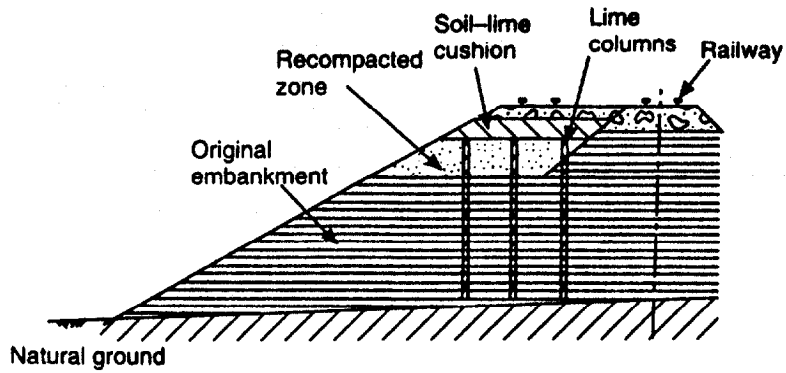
Cross section of a stabilized railway embankment in Bulgaria (Evstatiev et al., 1995).
